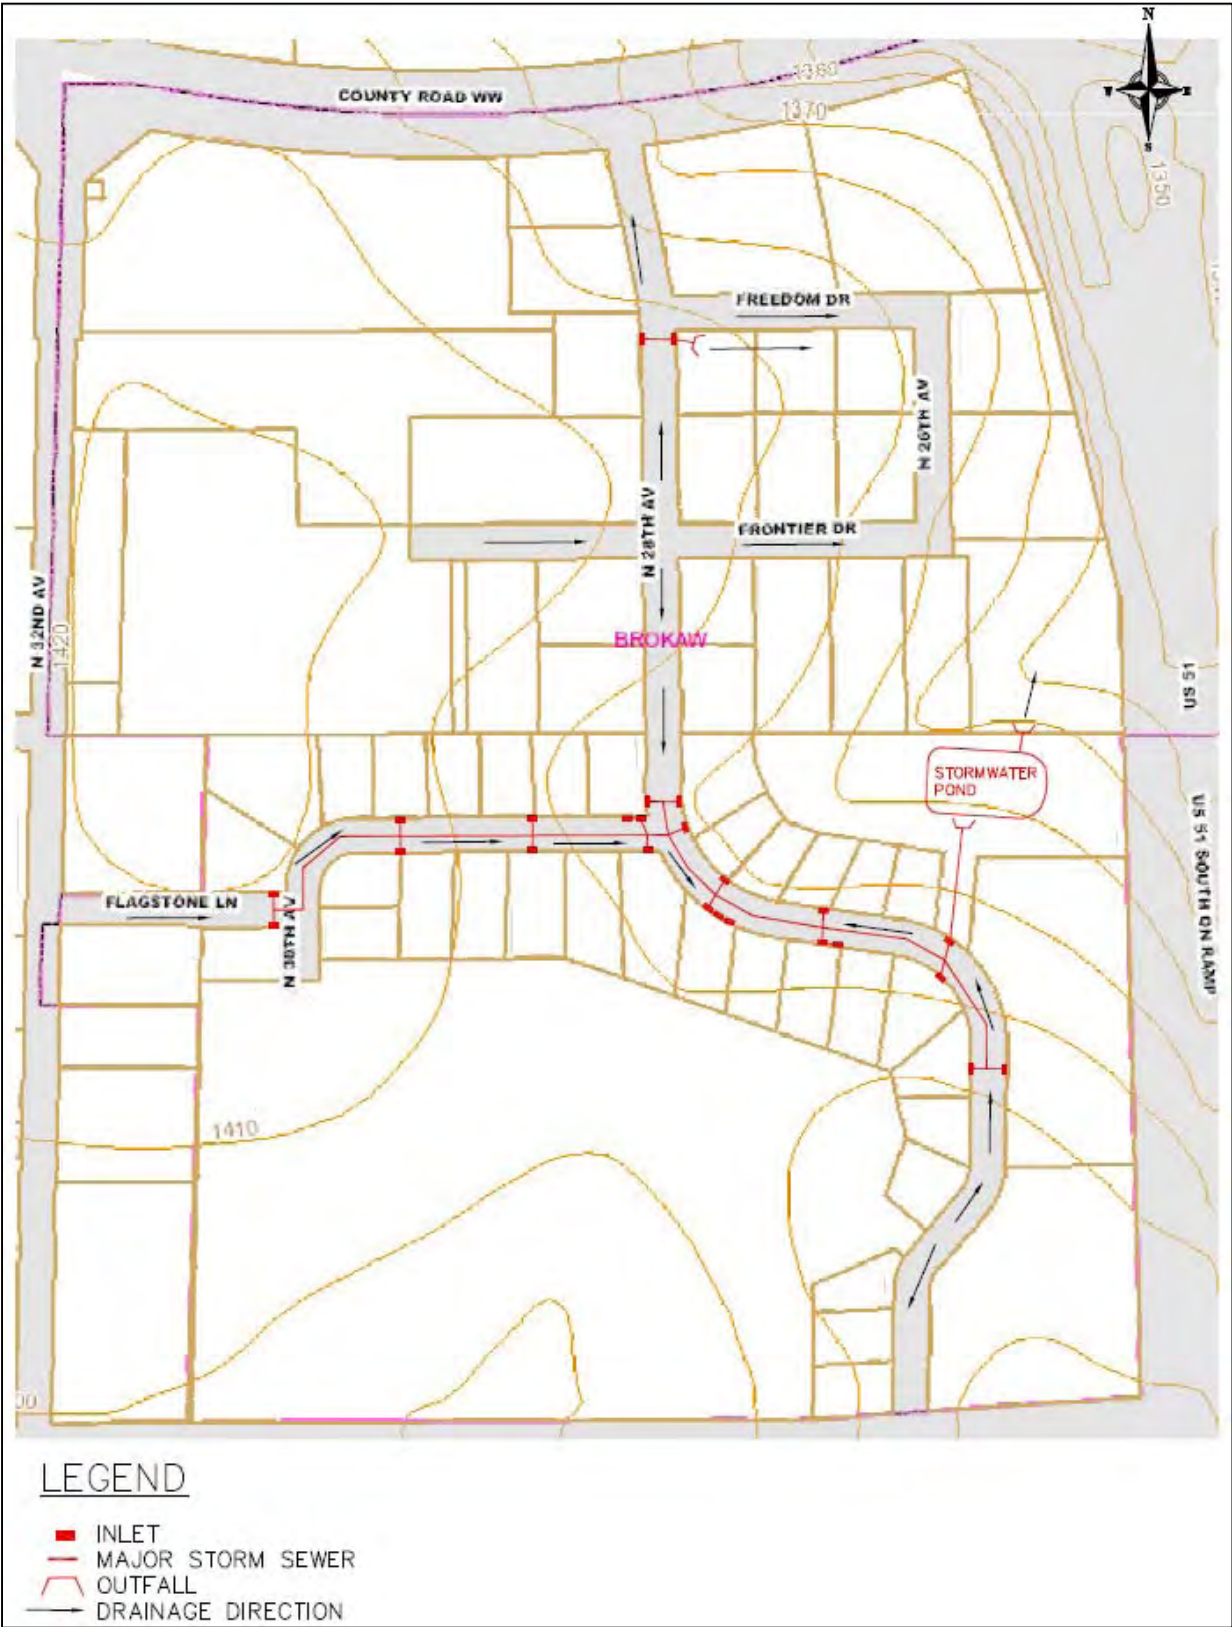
B – Village of Brokaw Westside Storm Sewer System Schematic
